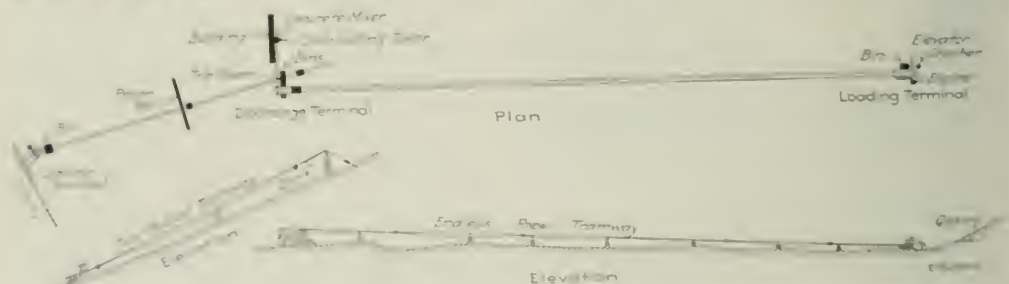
PLAN AND ELEVATIONS OF AERIAL TRAMWAYS HANDLING MATERIAL FOR A CONCRETING PLANT FOR THE NEW STATE PENITENTIARY AT BELLEFONTE, PENN.
